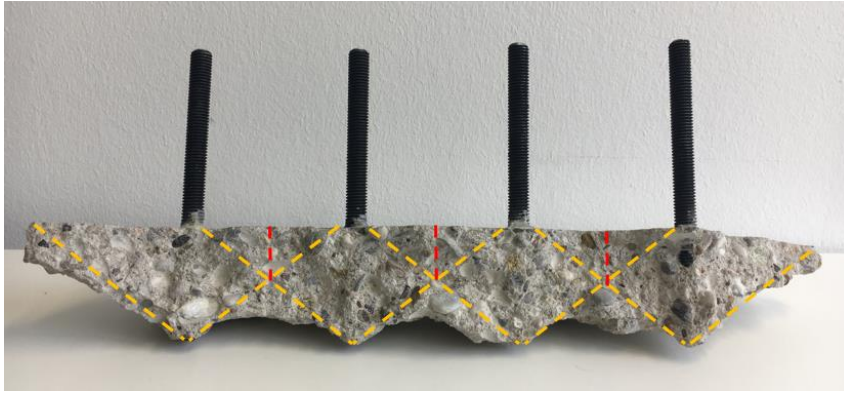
Photo of a 1×4 anchor group failed due to concrete cone failure
